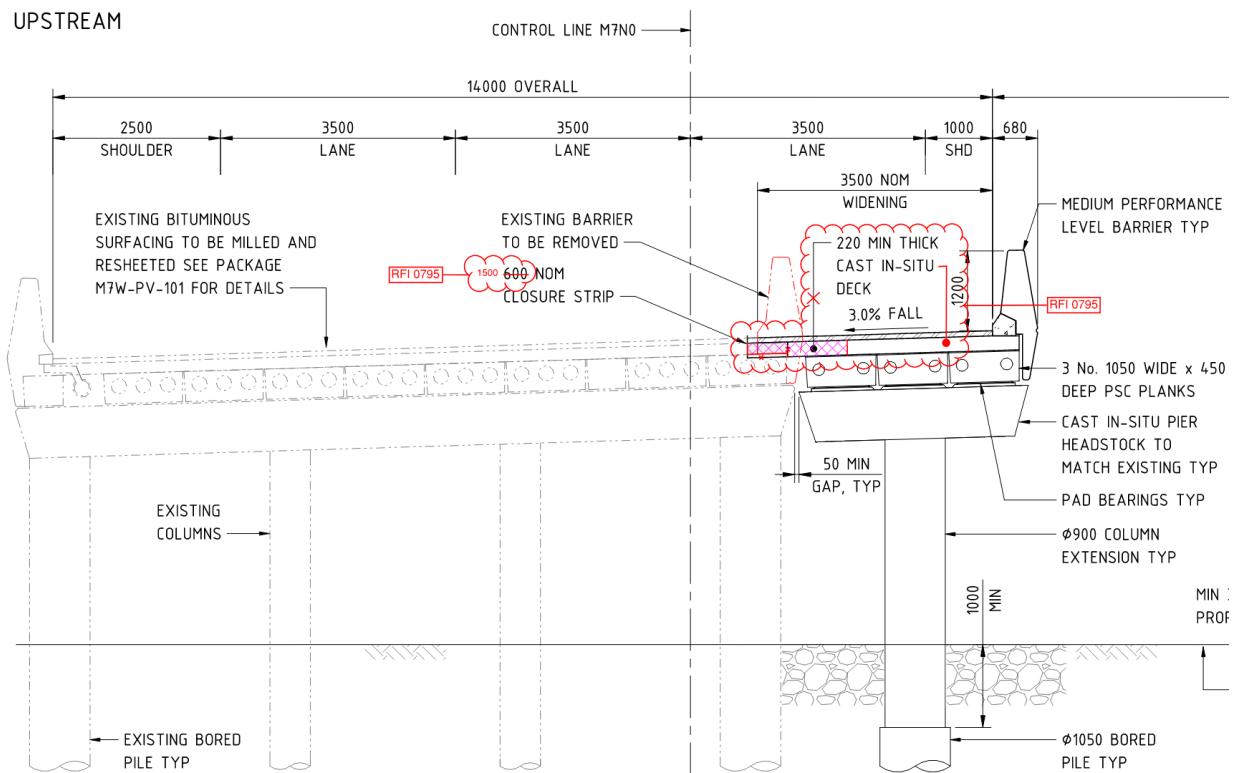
Typical bridge widening section over Piers – Plank Bridges
